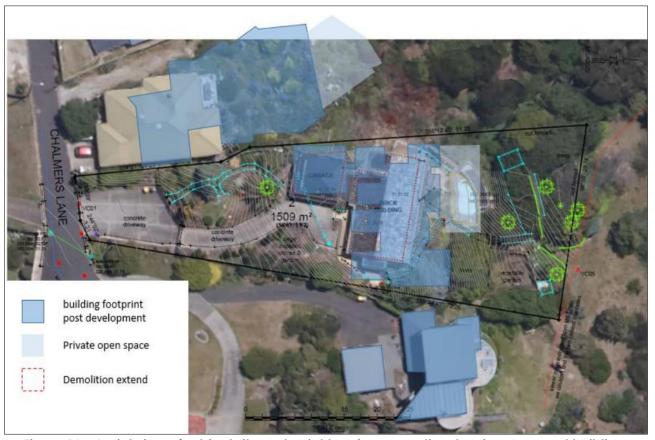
Aerial view of subject site and neighbouring properties showing proposed building footprints (Source: Veris)
